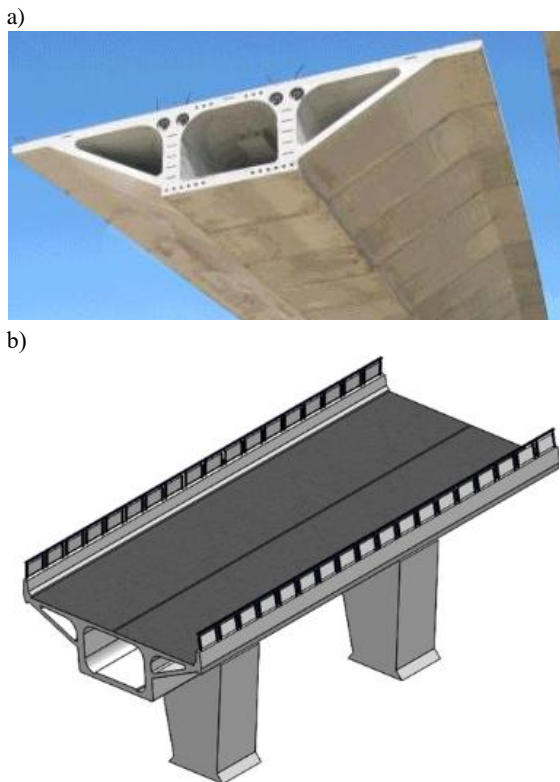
Box girder bridge example: a) built structure; b) a designed 3D CAD
